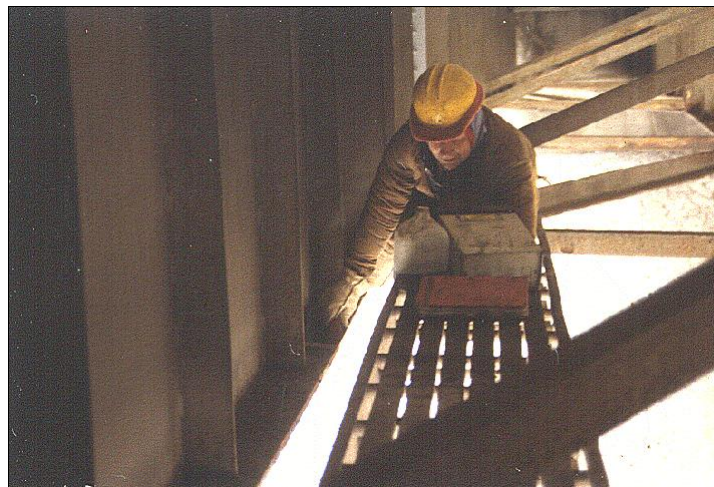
Inspector Performing Ultrasonic Testing for Crack Detection.
